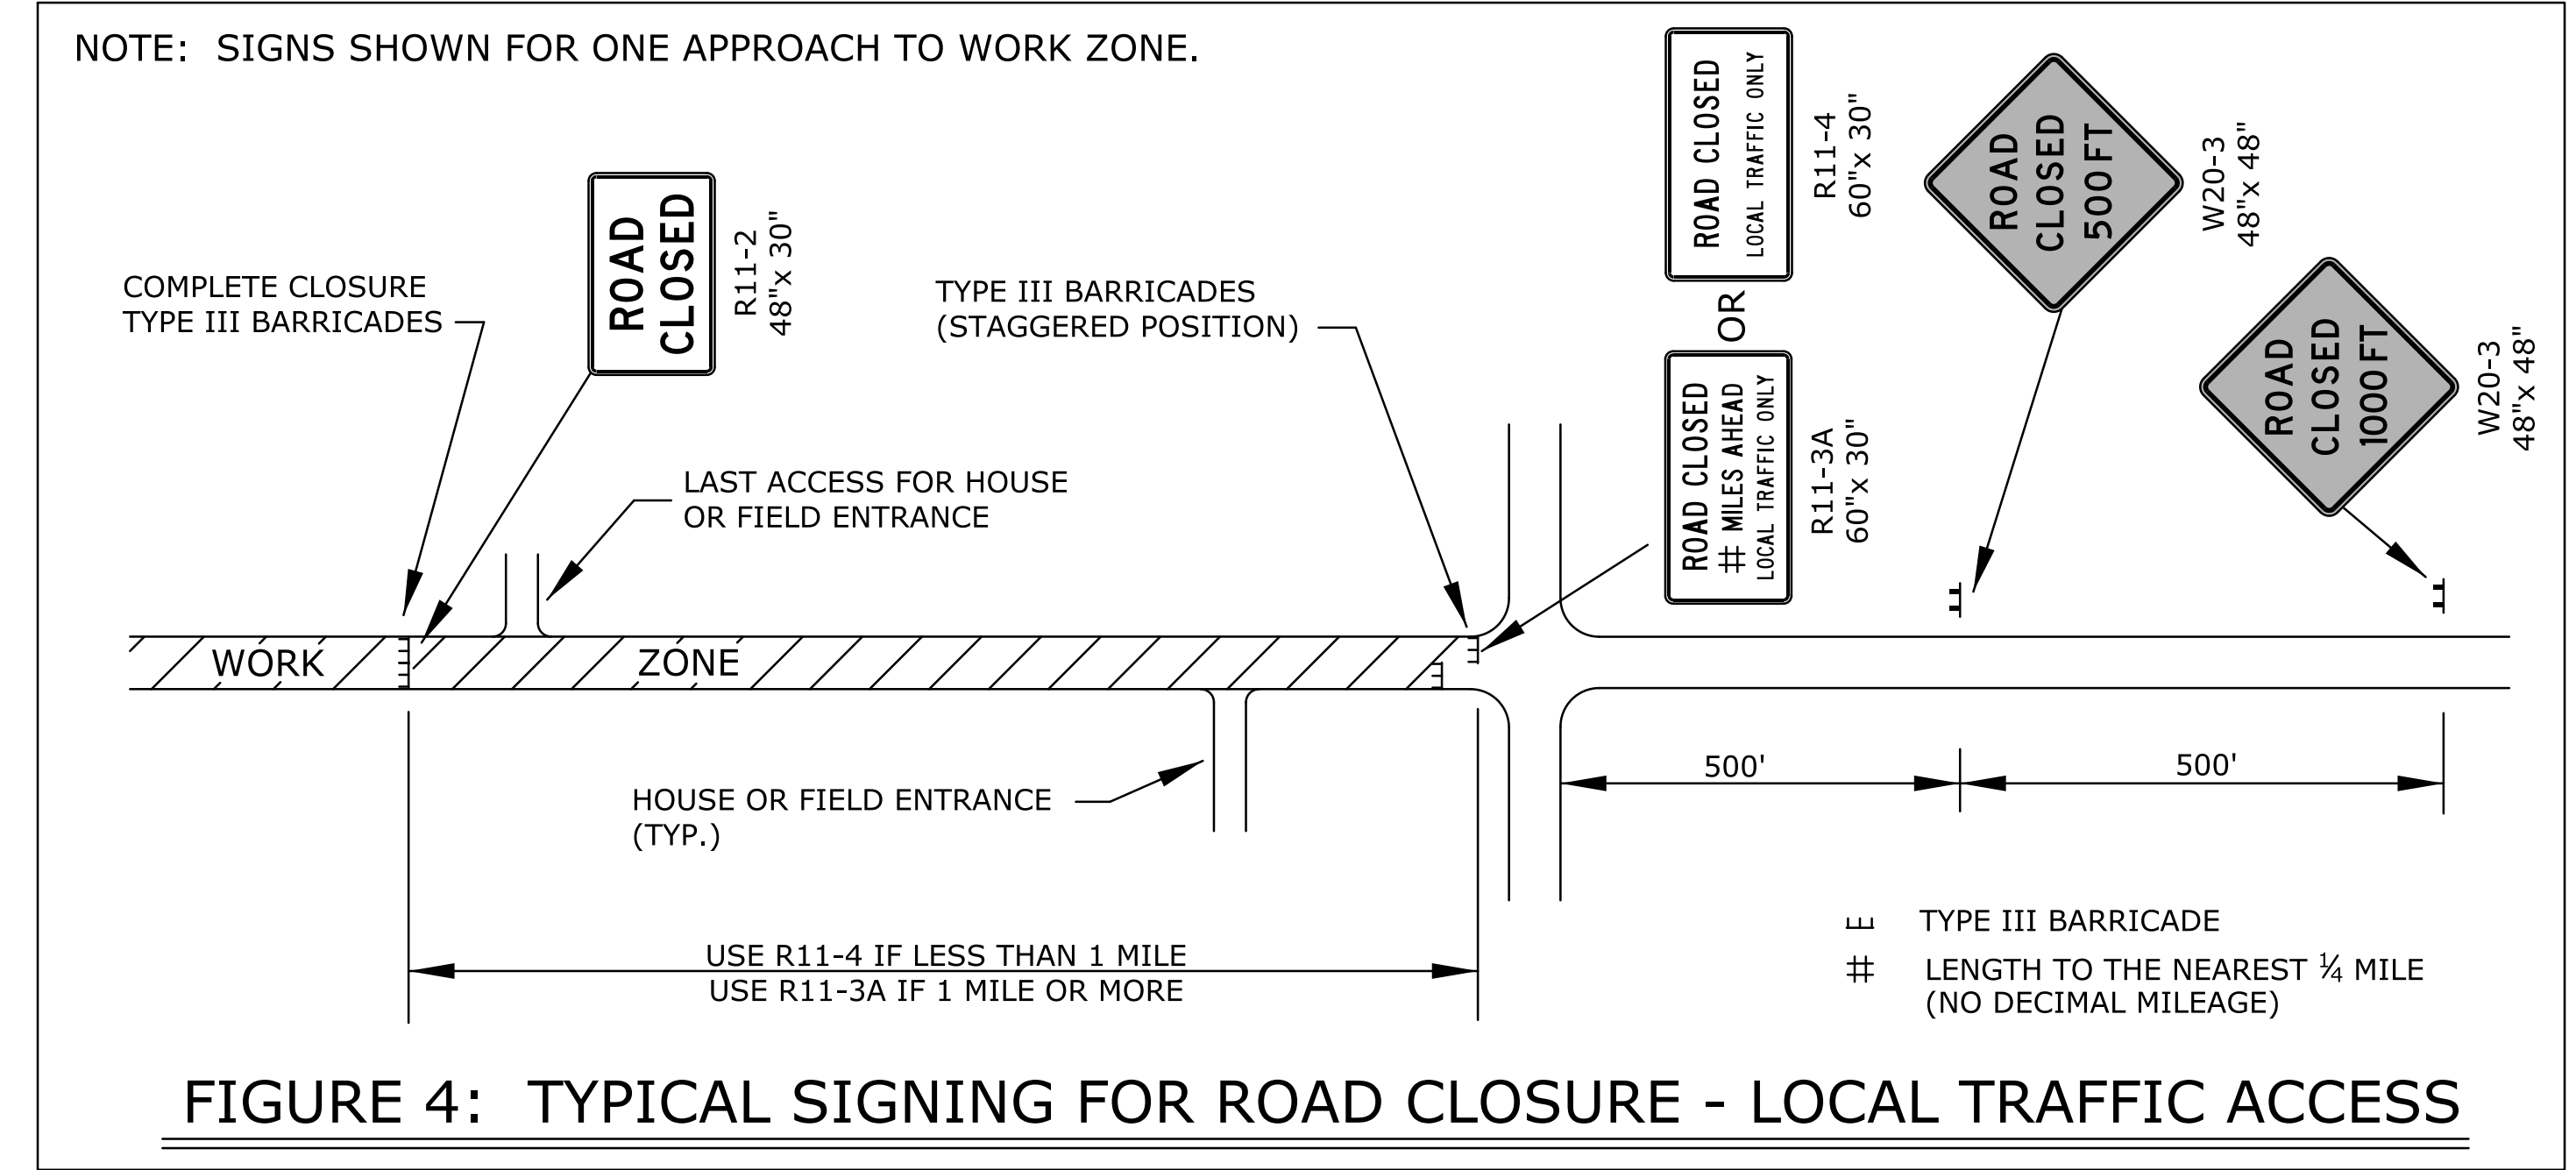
TYPICAL SIGNING FOR ROAD CLOSURE - LOCAL TRAFFIC ACCESS
